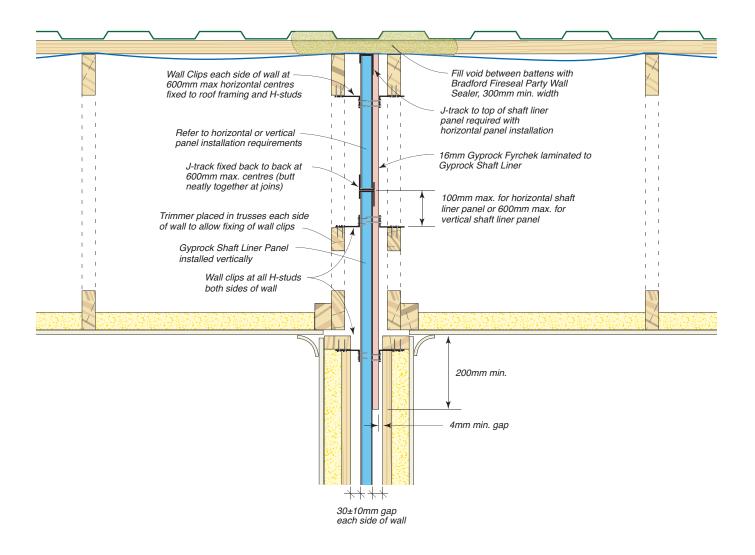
Roof Void With Horizontal Over Vertical Panels - Party Wall Perpendicular to Truss/Rafter (Front Elevation)
